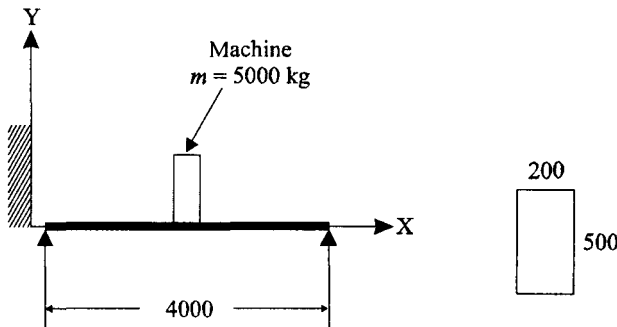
Machine Supported at Center of Simply Supported Beam
